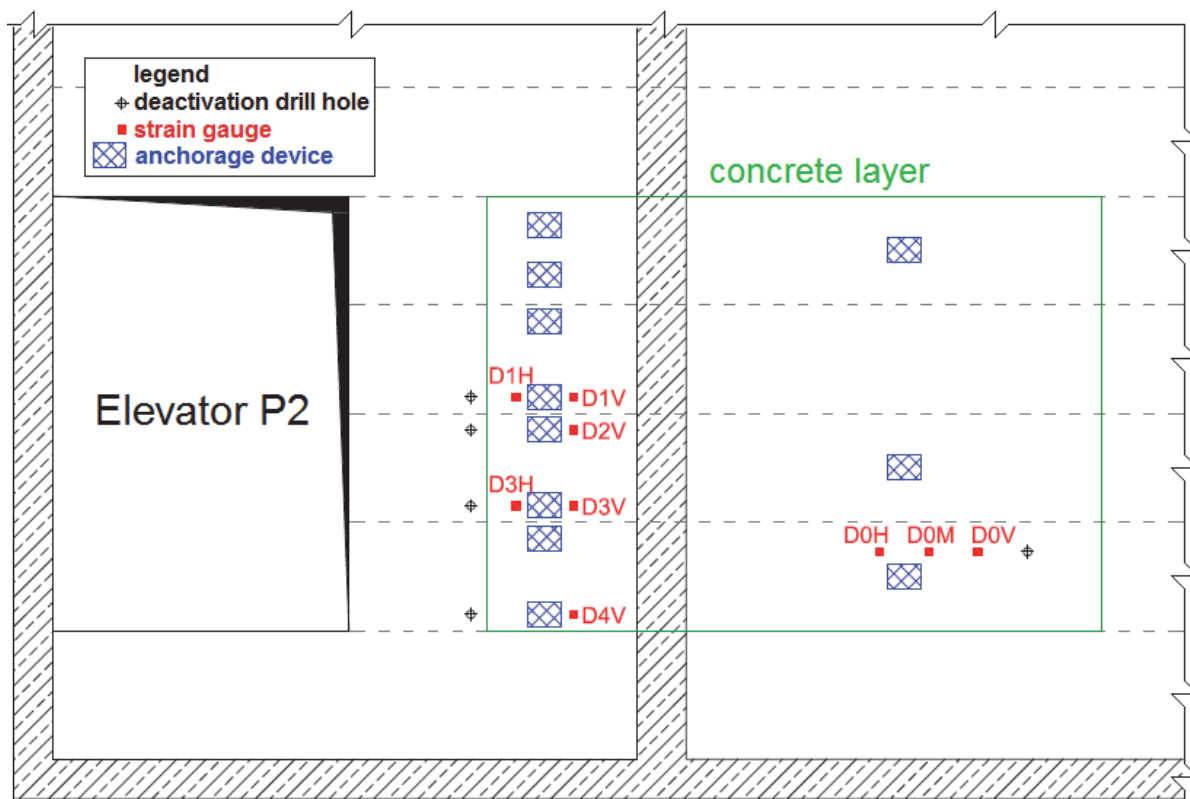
Monitoring setup showing the position of deactivation drill holes, strain gauges and anchorage devices in the layout plan
